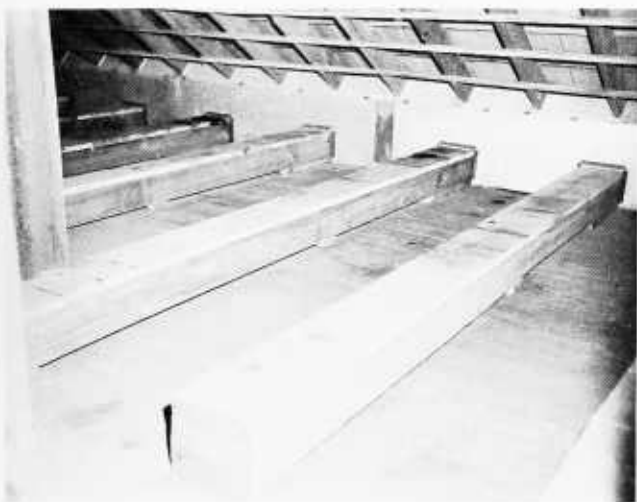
Removable box laterals, 4 feet apart on centers, plugged into a side tunnel or suction trunk.
